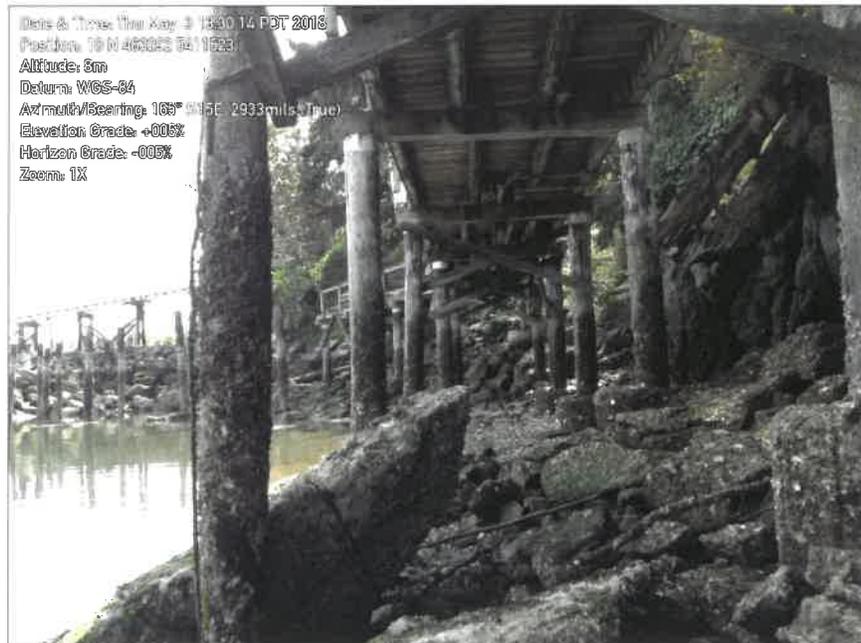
Abundant growth of algae and barnacles on native rock bank at south end of Segment 4, viewed to north. Tallest piles are 4 – 5 m high. 3-May-2018
